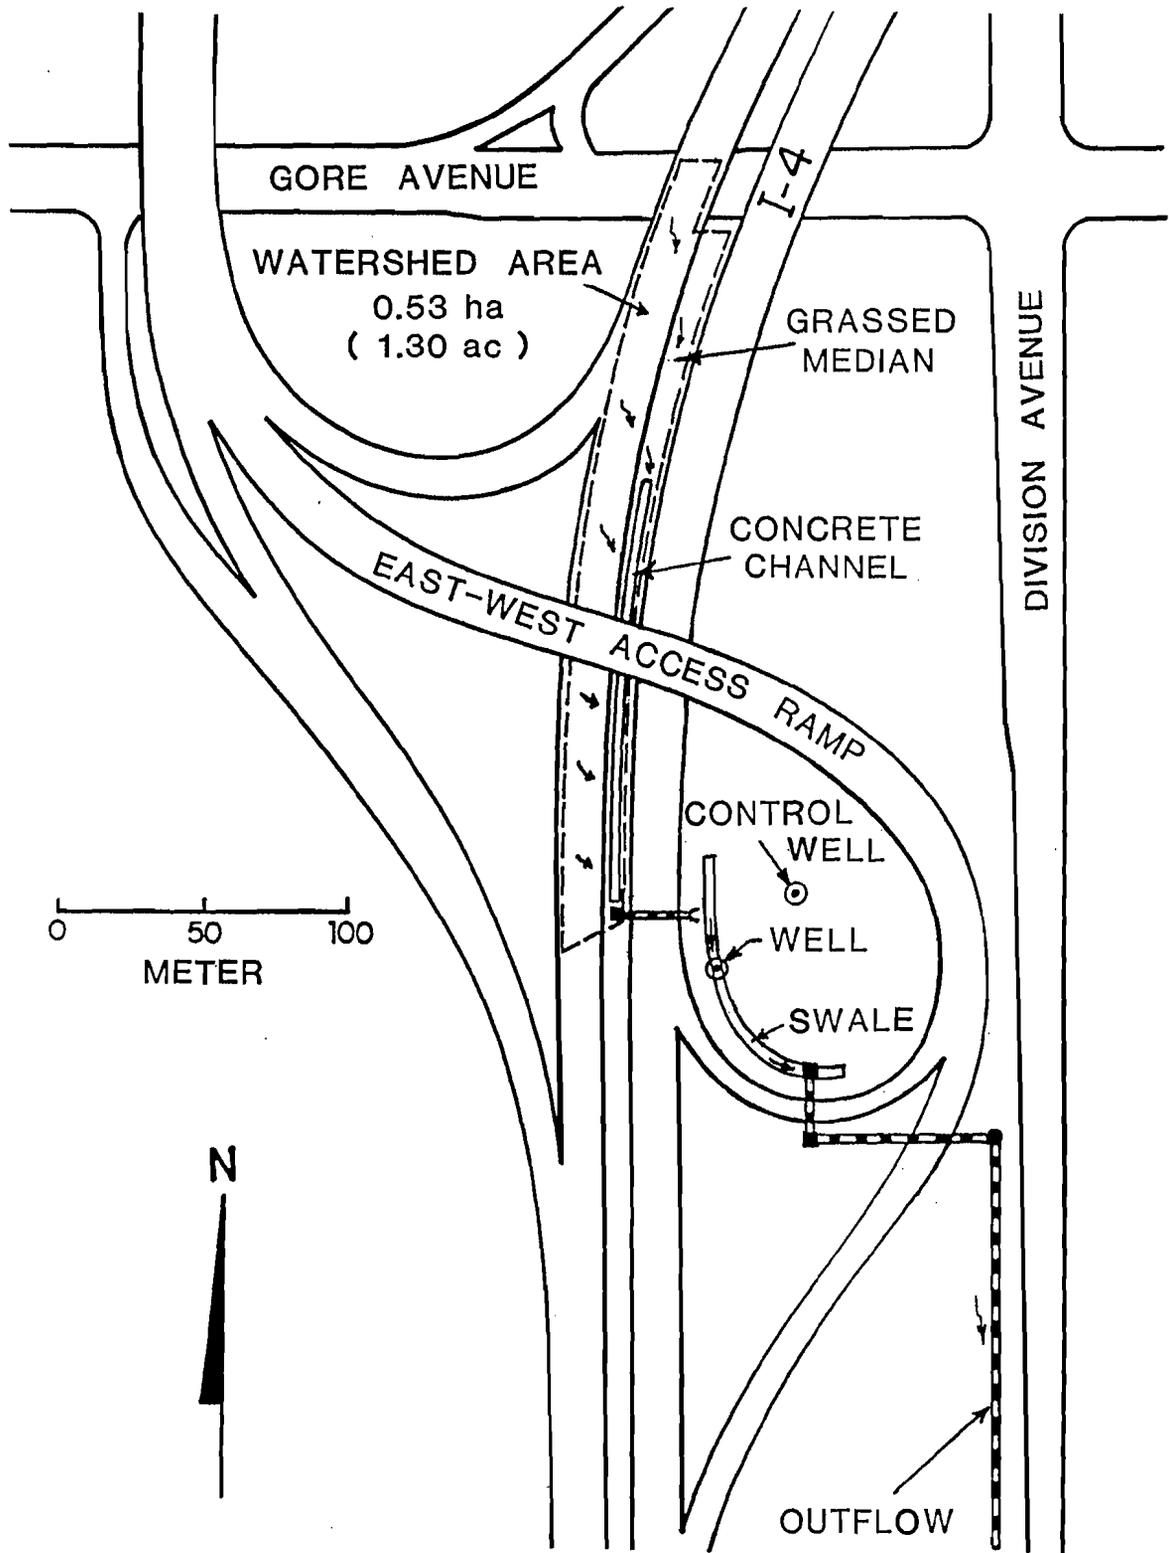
Schematic of the Dry Swale Study Site - Site 2.
